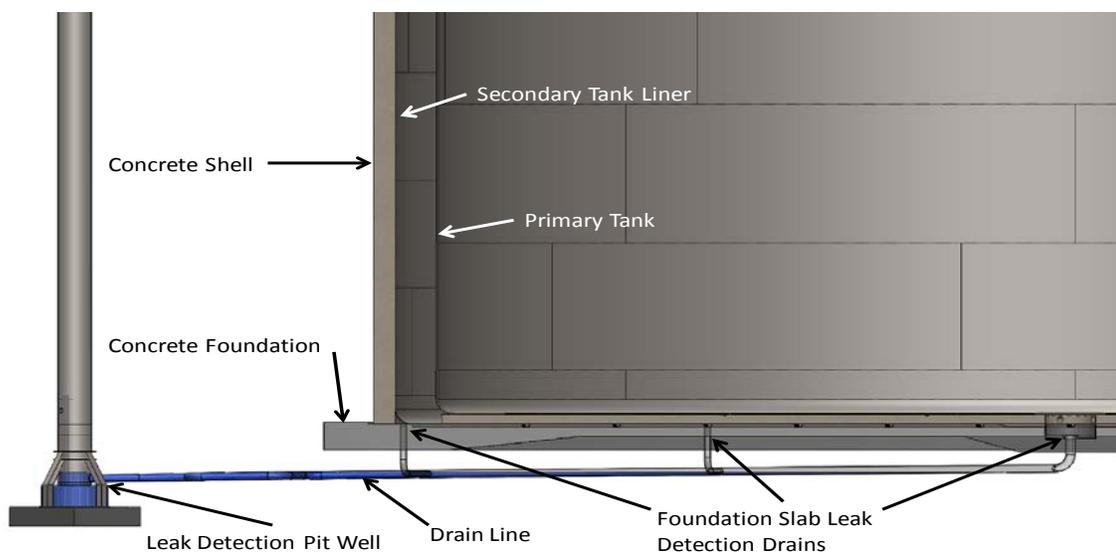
Tanks AN-101 through AN-106 Concrete Foundation
